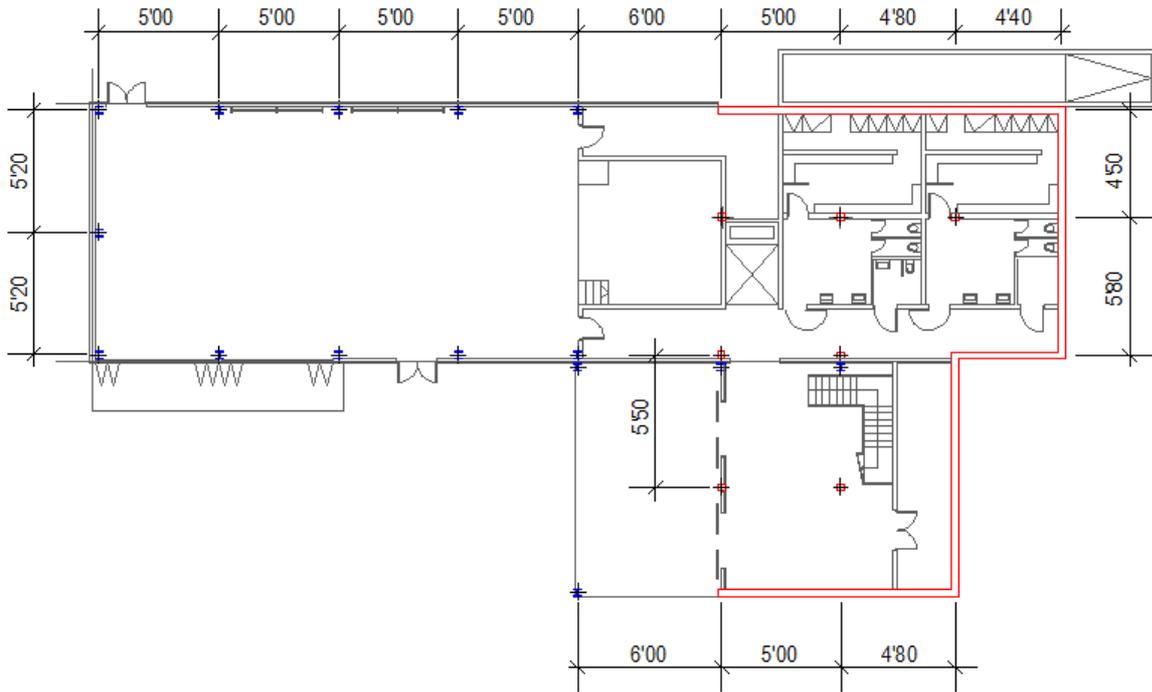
Distribution of pillars and location of the wall in the basement. PS horizontal section
